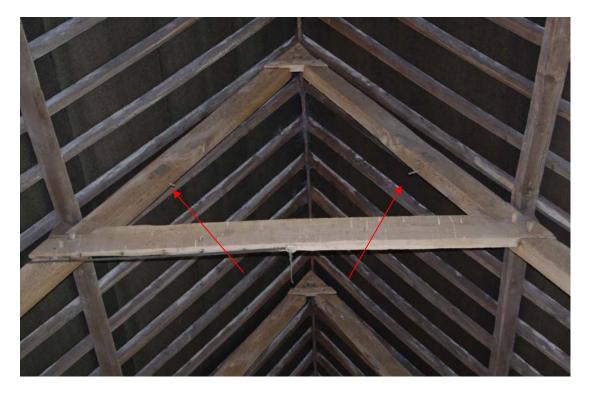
West range, Building A re-used roof timbers Looking south. Old mortice and tenon joint arrowed
